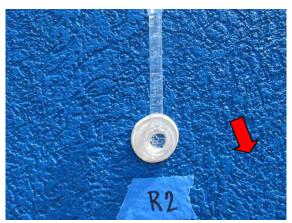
Water filled to 5ml mark. No water was absorbed into tested area.
